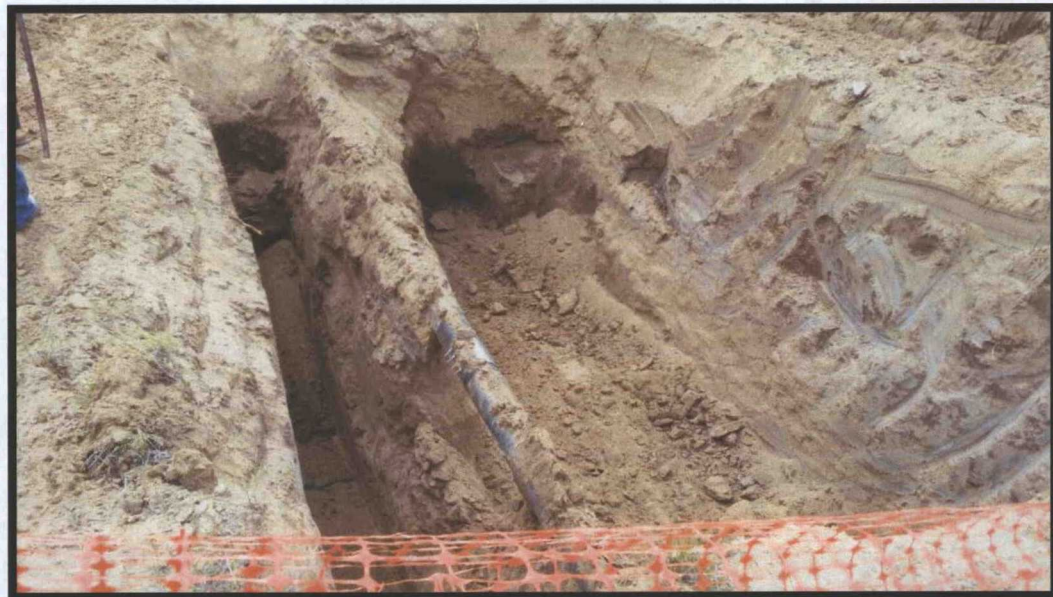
Excavation of Lateral 2A-4 South location after narrow bucket track mounted excavator was used.
